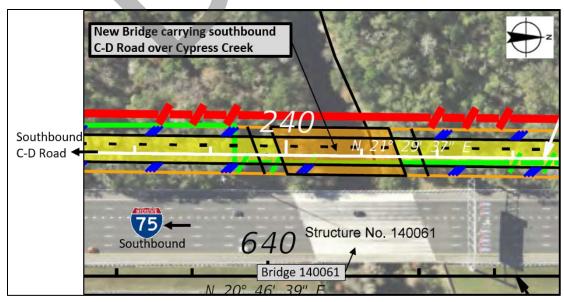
New Bridge-Southbound C-D Road over Cypress Creek
